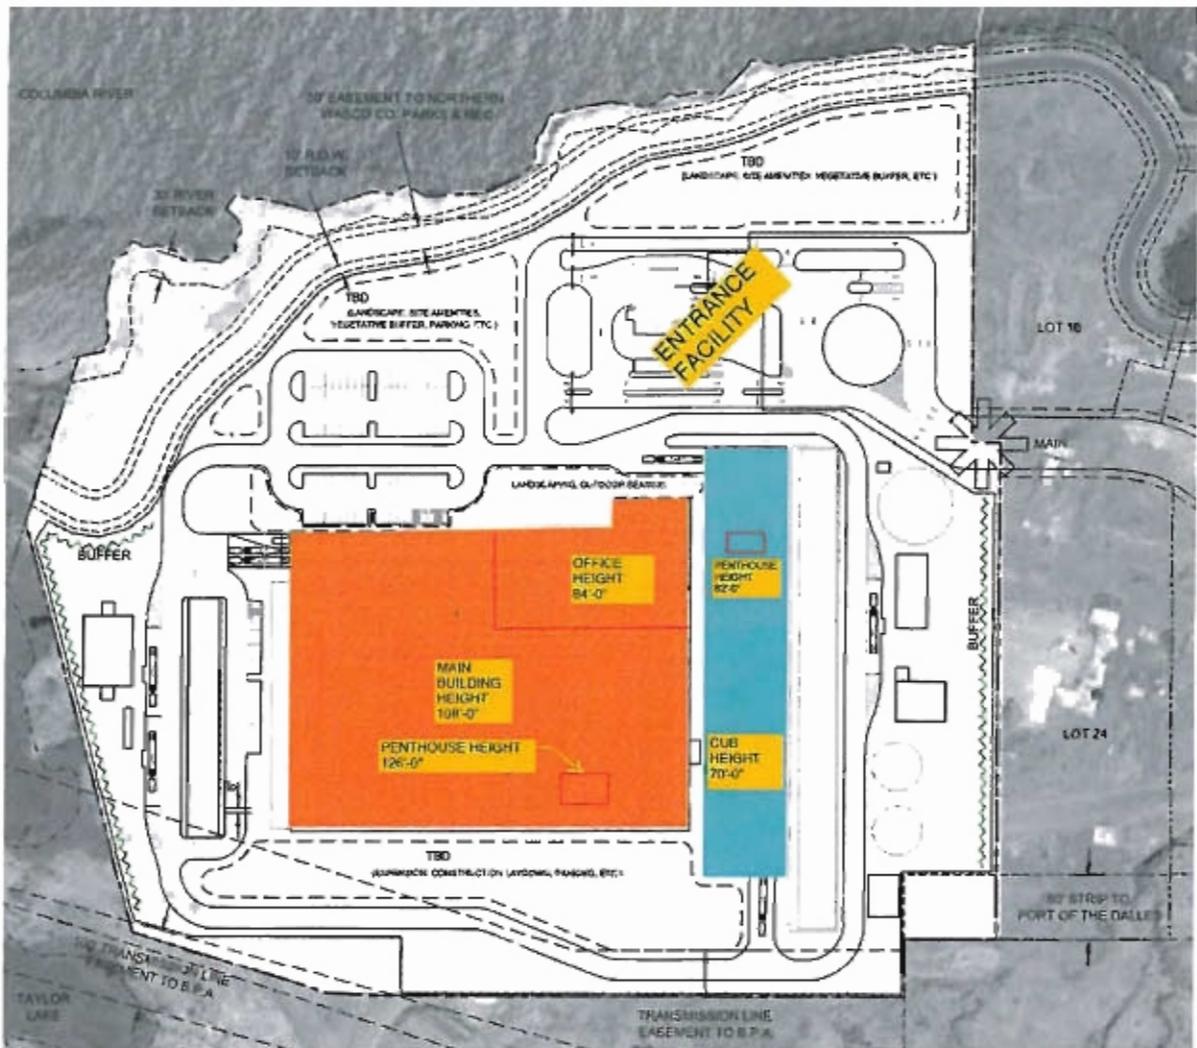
Site Plan (elevations provided for all structures greater than 55' in height)
